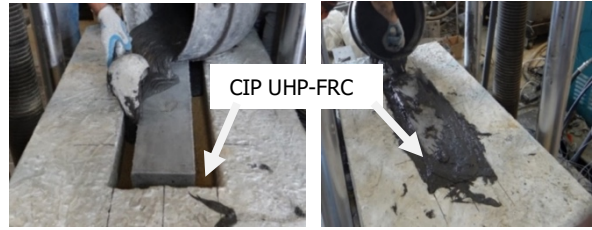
Cast-in-place UHP-FRC between the precast UHP-FRC panel and existing plain concrete slab (no dowel bars were used).
